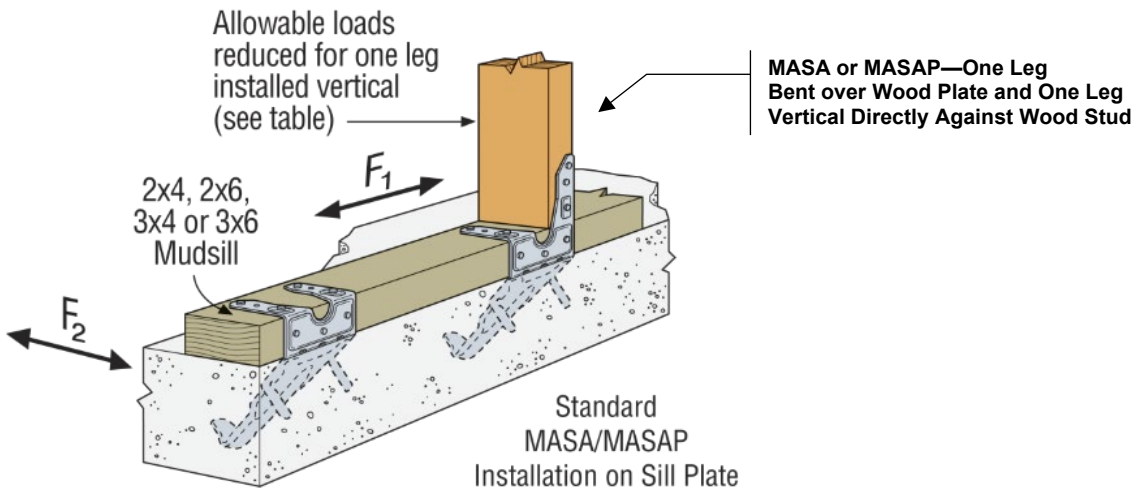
TYPICAL INSTALLATION OF MASA AND MASAP FOUNDATION ANCHOR STRAPS ON SILL PLATE
